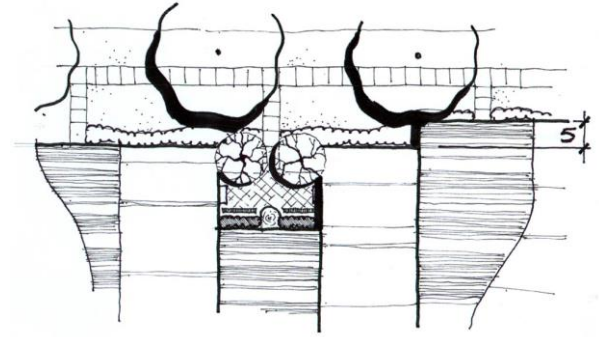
Adjacent buildings, whether separated or connected common walls should not differ in front setback by more than 5 feet except for the purposes of forming a courtyard.
